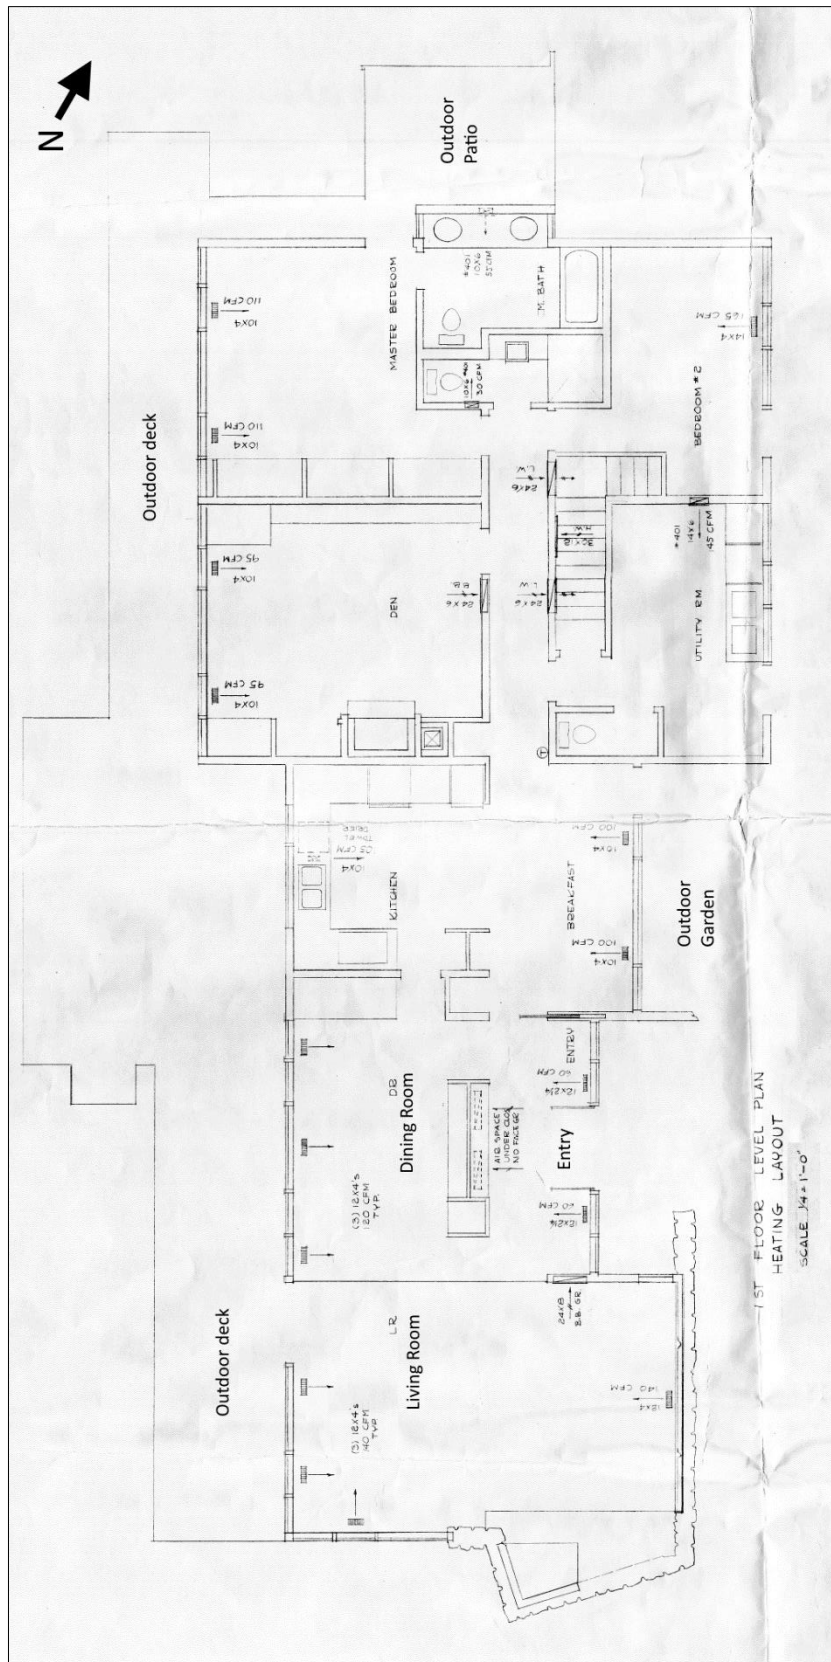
Sketch floor plan of Wenberg House. Base plan is taken from Mithun & Associates Architects' first floor heating plan, drafted by C. Myrick, June 15, 1962. Source: Louise Bruse Wenberg Luce private collection.
